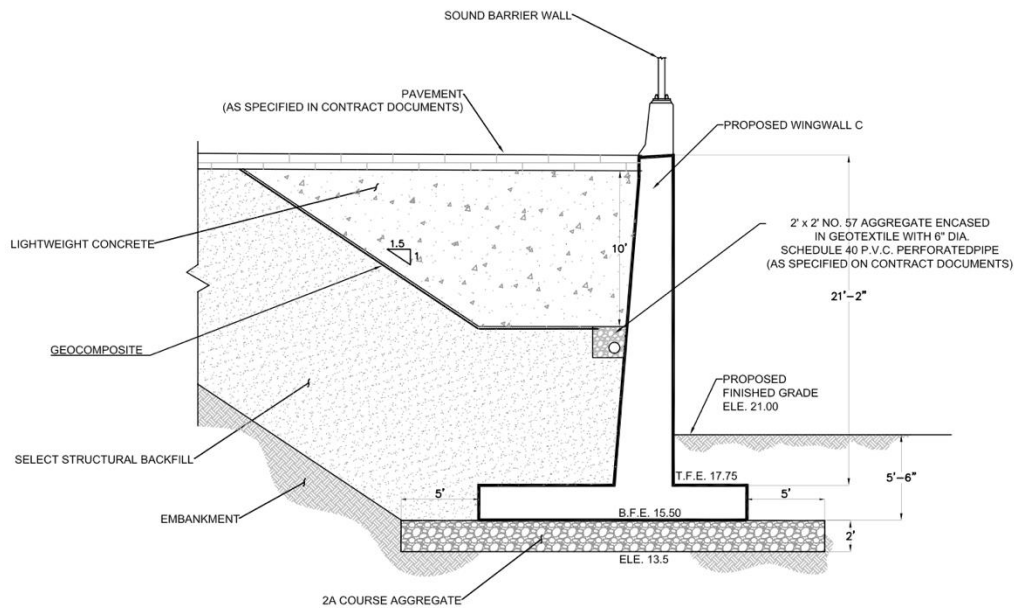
Typical cross section for Wingwall C (0095 Over Shackamaxon Street, S-26064).
